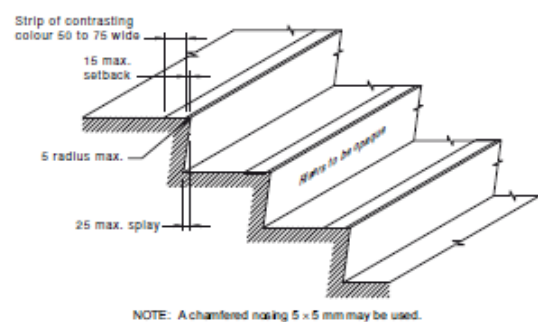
(A) A TYPICAL STAIR NOSING PROFILE WITH NOSING STRIP
